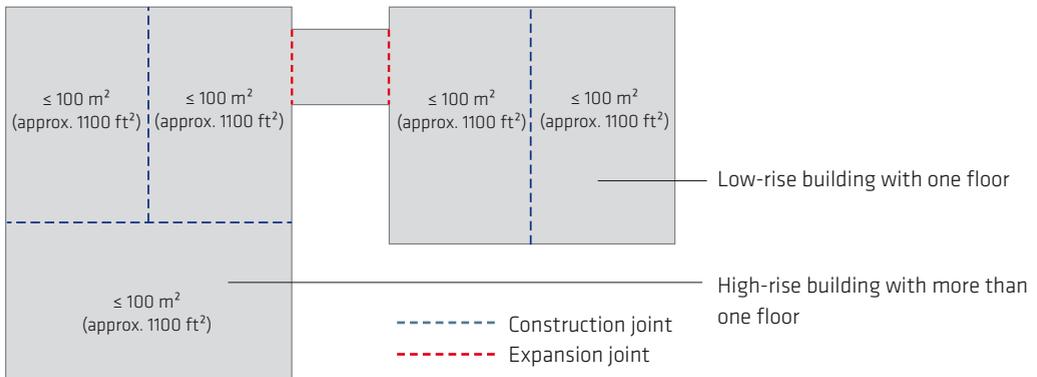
Example of the typical layout for concrete construction and movement (expansion) joints
